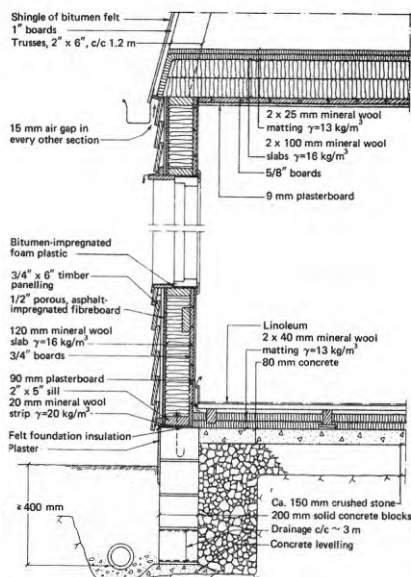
Vertical section through external wall in the timber frame house including window surrounds and seals between attic floor and roof and ground floor and foundations. In all cases, insulation consisted of mineral wool (Gullfiber).
